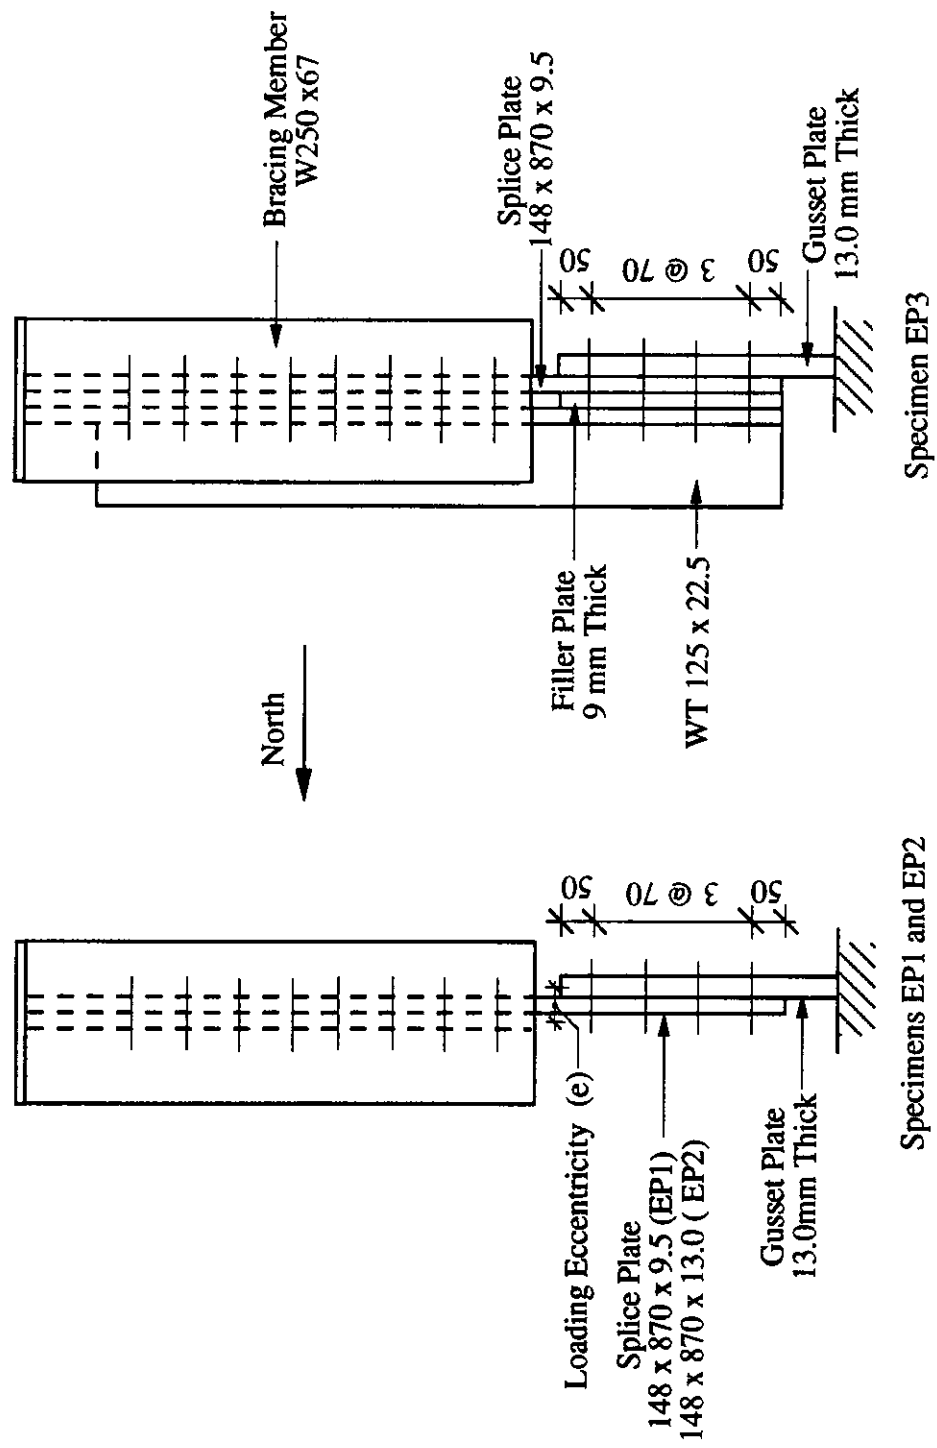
Splice Member Arrangement for EP Type Specimens
